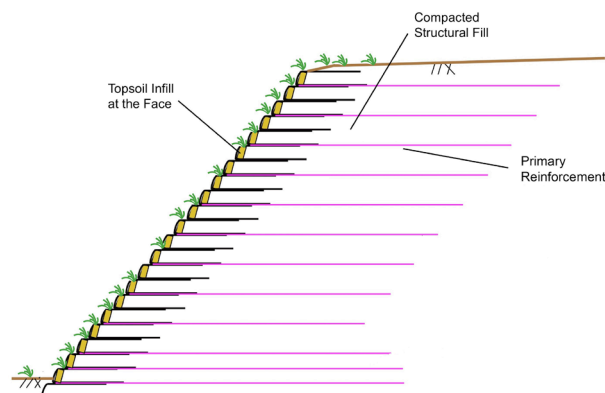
PYRAWALL reinforced soil slope with additional geosynthetic layers
